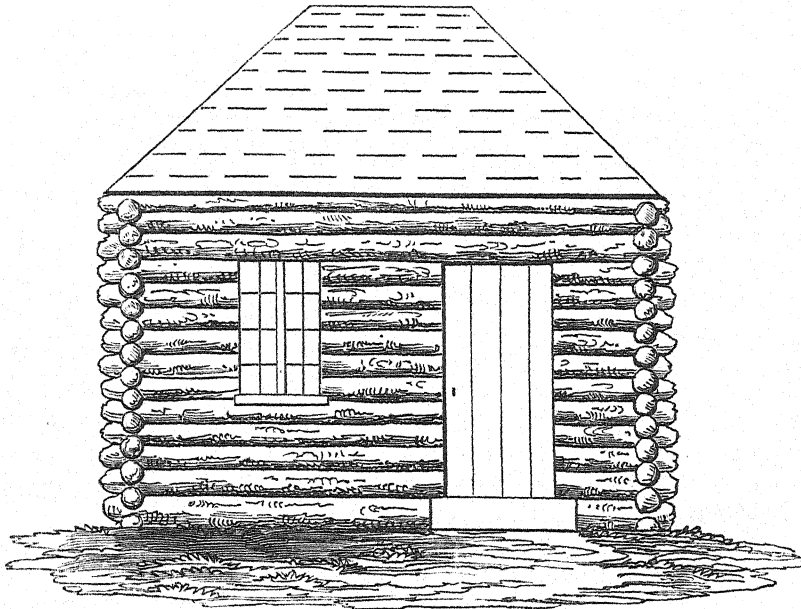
Front Elevation.—(Scale 5 feet to 1 inch.)
